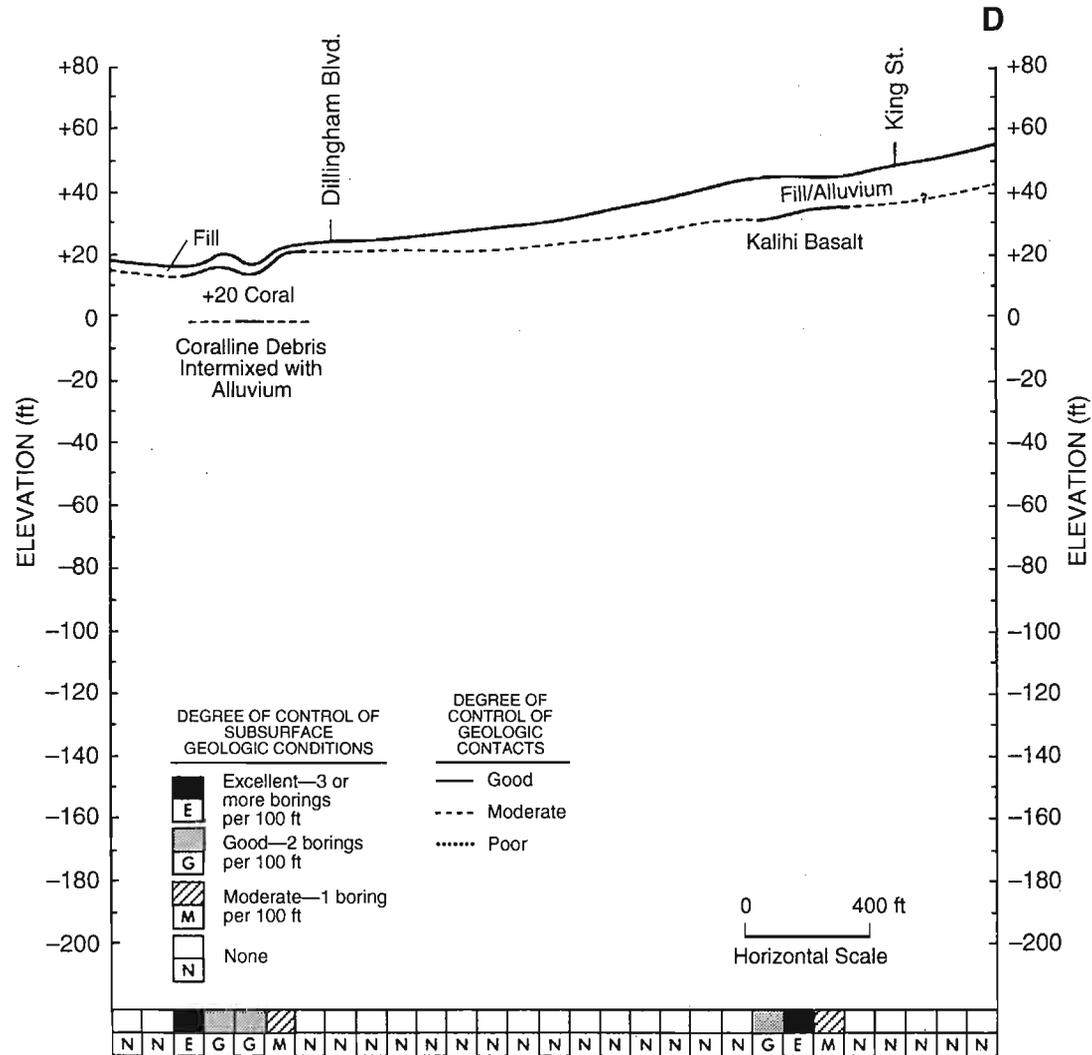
Subsurface section D-D' for the downtown Honolulu study area
